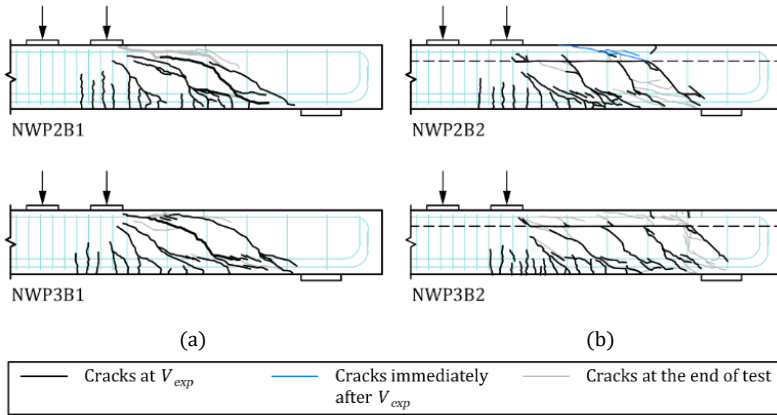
Examples of crack patterns in rectangular beams with web reinforcement: (a) monolithic specimens; (b) composite specimens.
